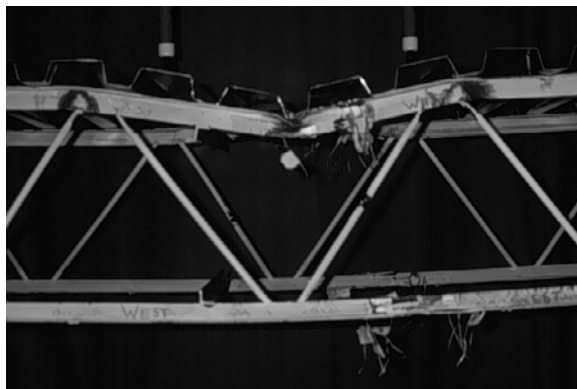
Failure Mode for 16K2-DX-2 West Joist
